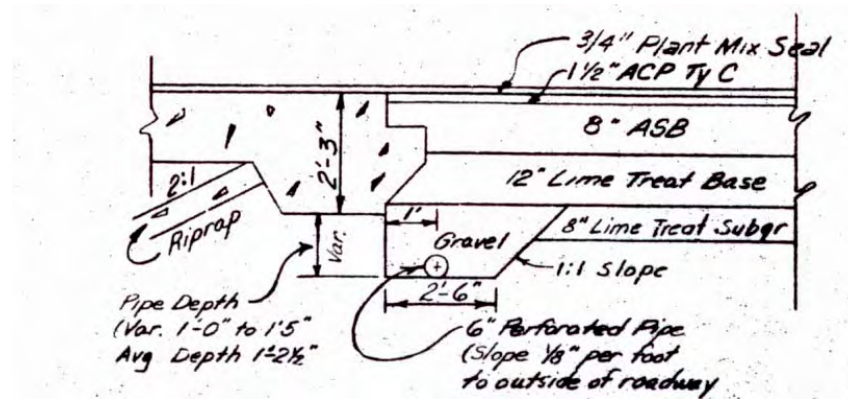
Bridge End Detail Showing Subdrain System Used in the Houston District
